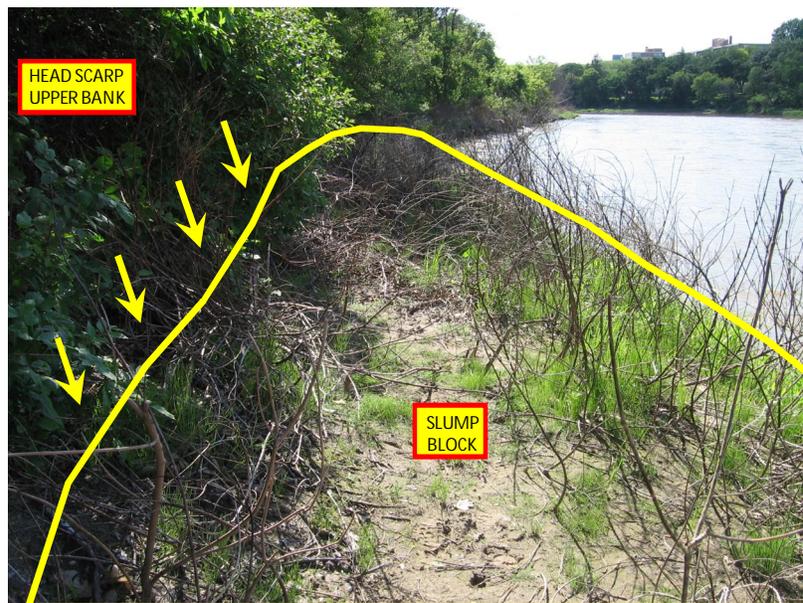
Top of slump block facing upstream (west) from location of pipe crossing.
